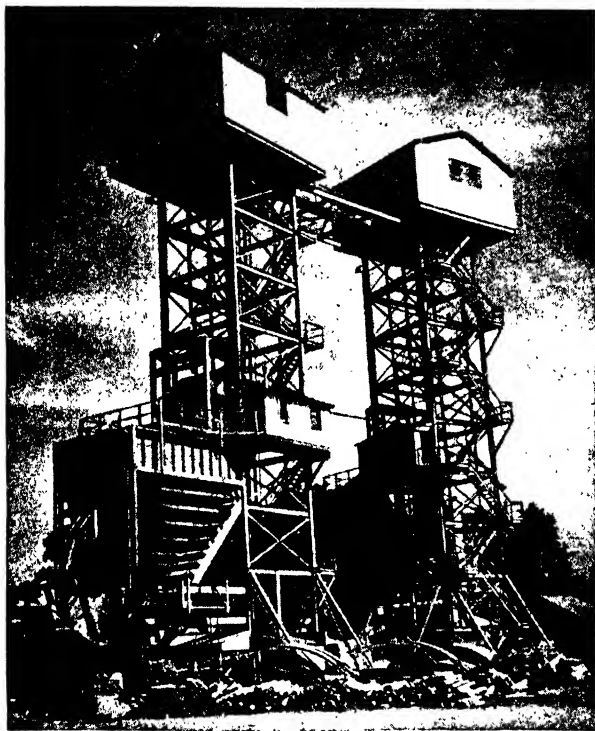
Double headframes over the uptake and downtake shafts at Shaft 19, Delaware Aqueduct. Mine hoists are located on top of the headframes; each shaft has a skip and cage in balance.
